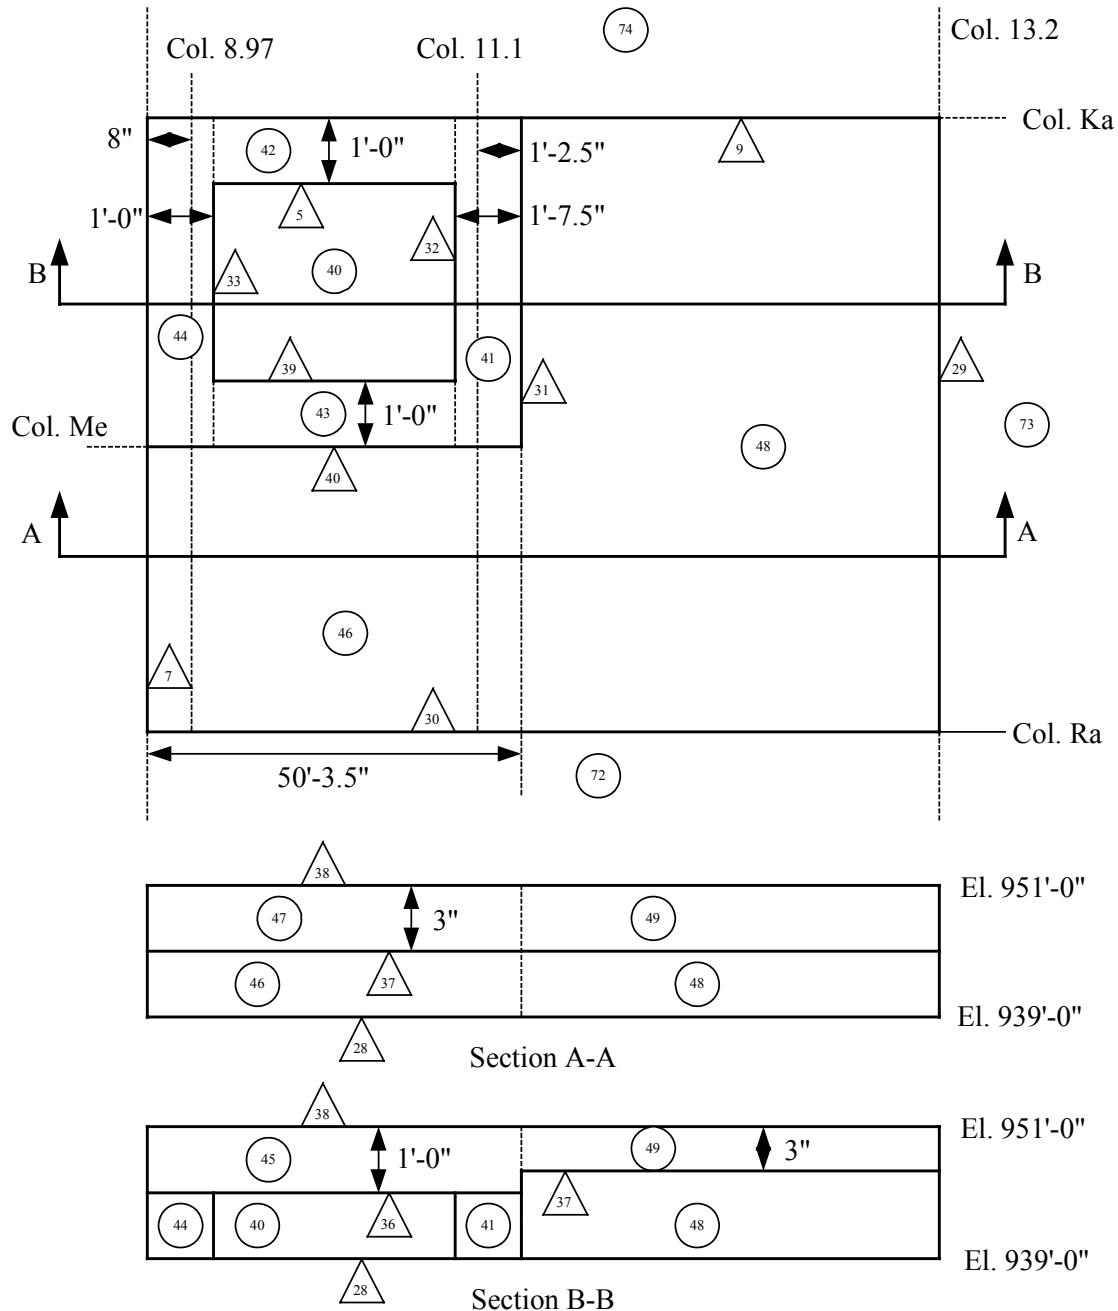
Geometry Model for the Control Building, Elevation 939'-0" (Not to Scale)
